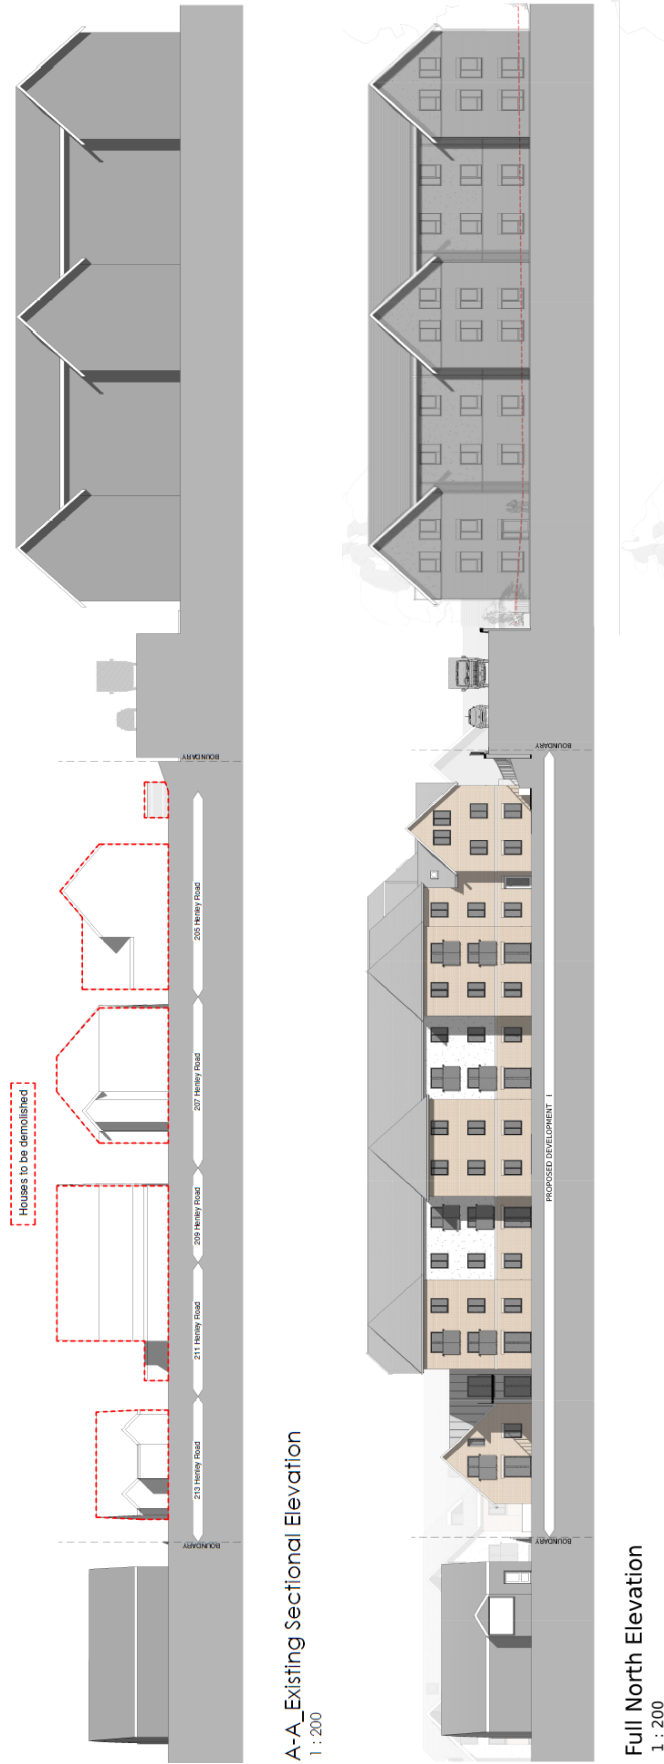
Part 1/3 - Existing and proposed front elevations (no account of topography)
